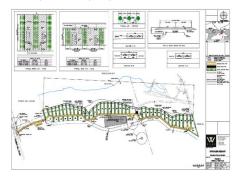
Image E – Trailer lot layout that includes development within the erosion hazard (Site Plan).
